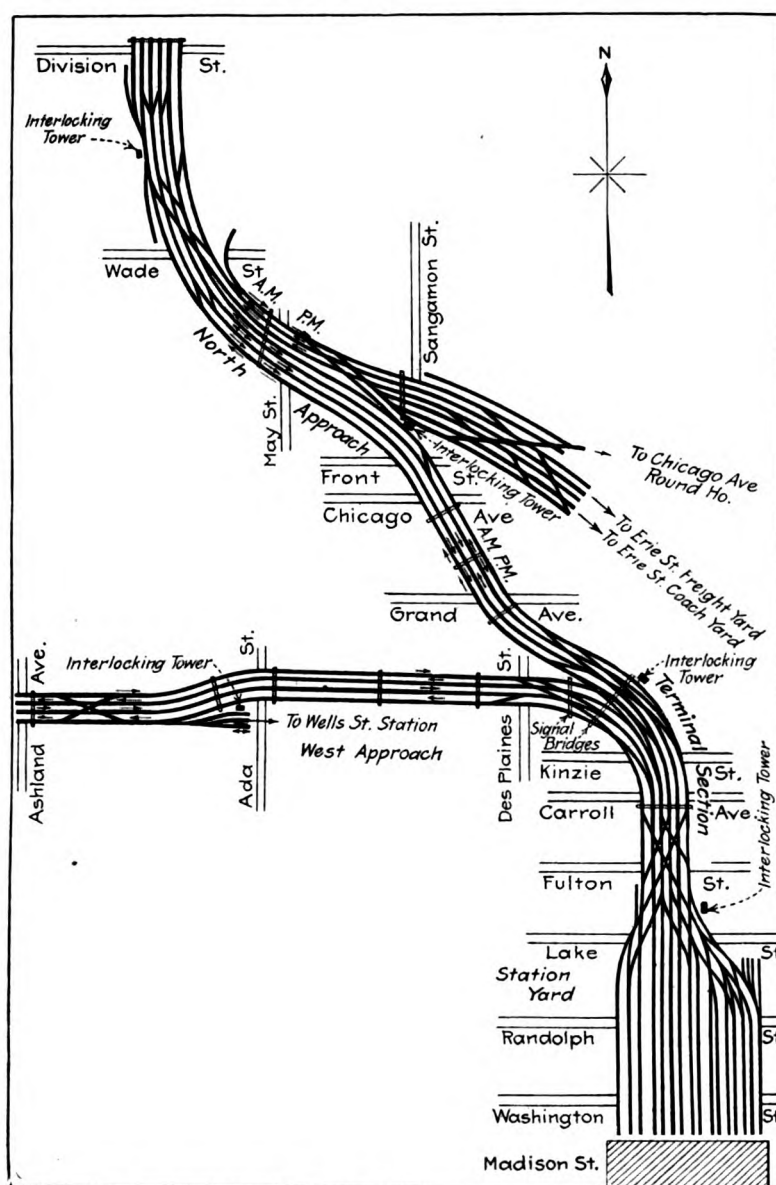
GENERAL PLAN OF TERMINAL AND APPROACHES, SHOWING THE ARRANGEMENT OF TRACKS AND THE LOCATION OF SIGNAL TOWERS AND BRIDGES.
